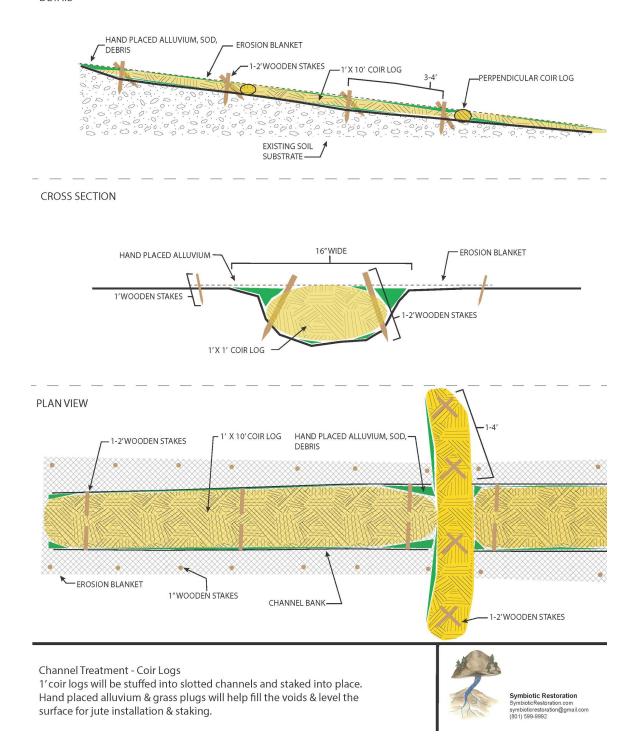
Schematic drawing showing the typical cross-section and plan view for hand-built full channel fill using primarily coir logs, with hand-placed fill, plantings, and erosion control
